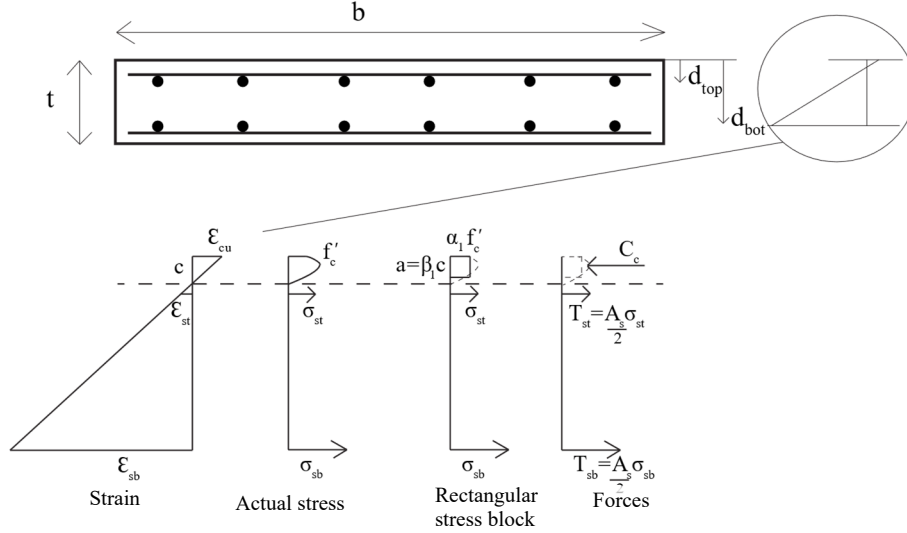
Strain profile, stress profile, and resultant forces for DR concrete walls.
